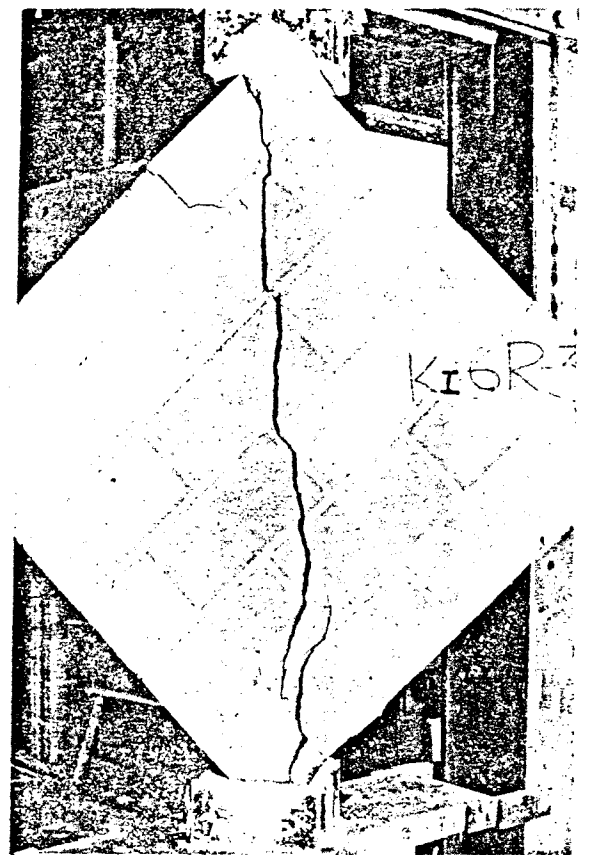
Racking Test at failure. Specimen contains Korfil Inserts & is Reinforced with 1 #6 at 24" on center.
